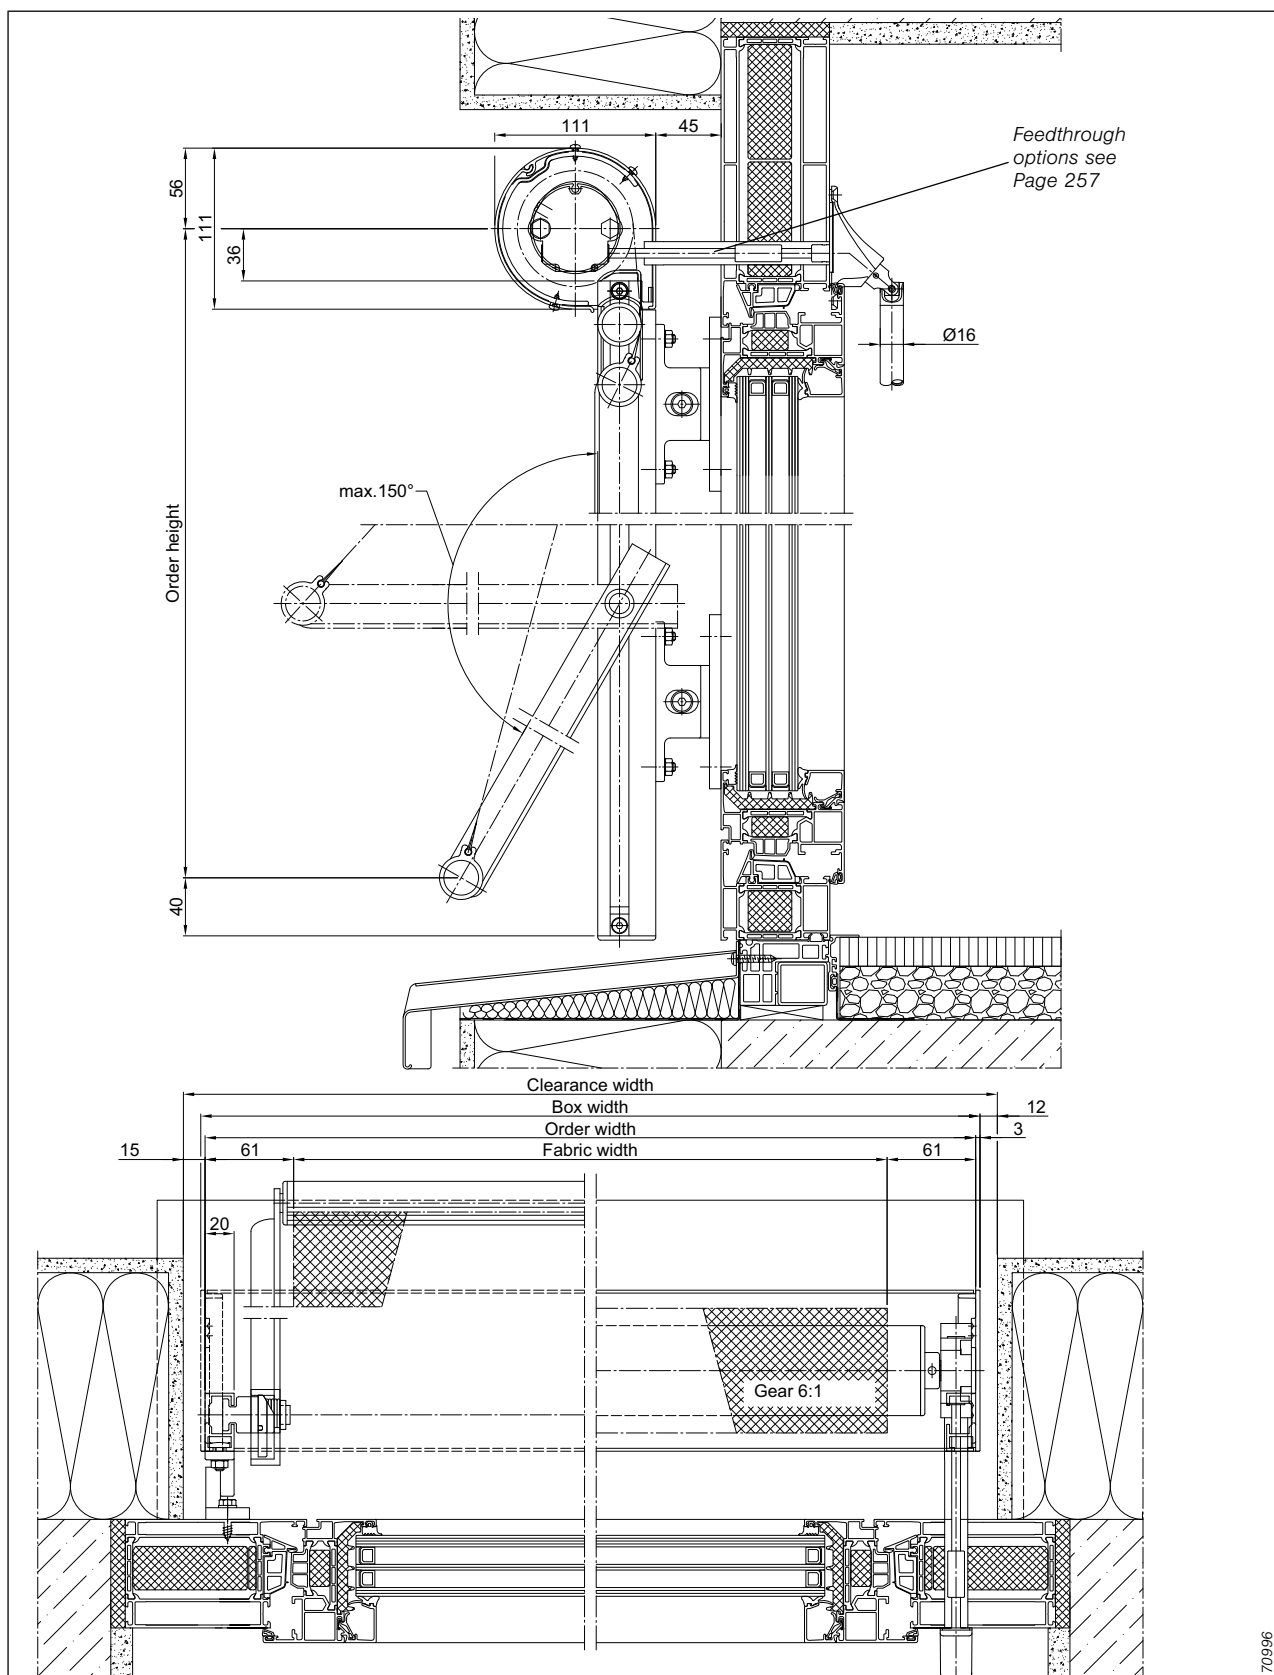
Markisolette 109 with guide rail 20x40 mm, gear 6:1, cover panel type 23.3
